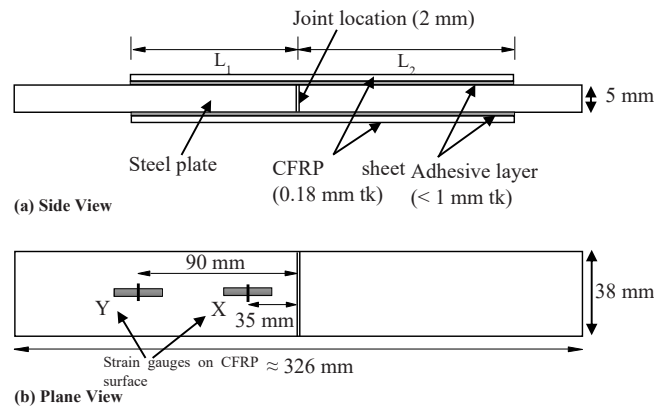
(a) A schematic diagram of double strap joint (b) Sample specimen.
